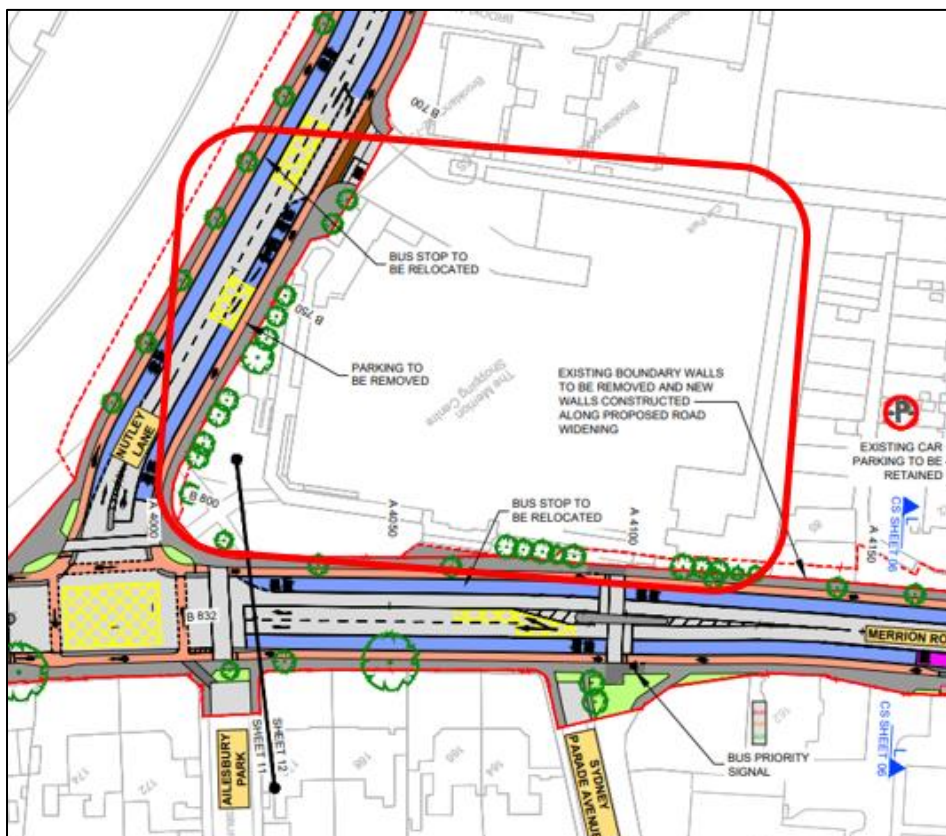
Proposed new Layout at Merrion Shopping Centre
